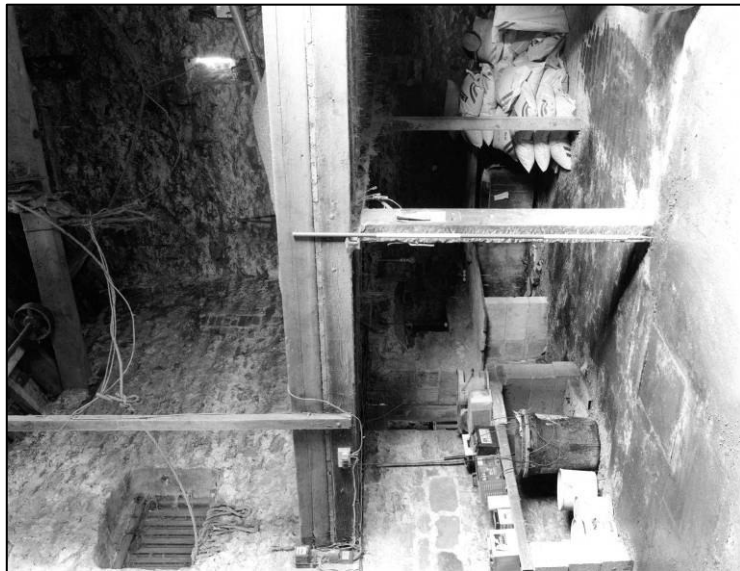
Barn: interior, looking SW (photo 6/11) (top to left).
